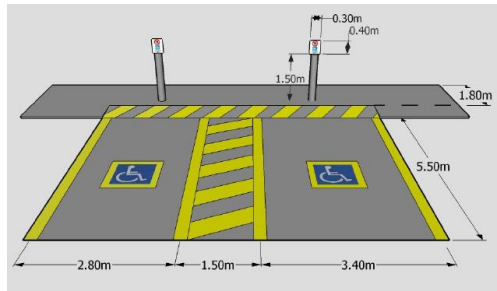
Accessible Parking Spaces which have a type (A & B) Spaces, and Access Aisles [67]; and Van Parking Side Exit Ramp (Type B Spaces) [66].
